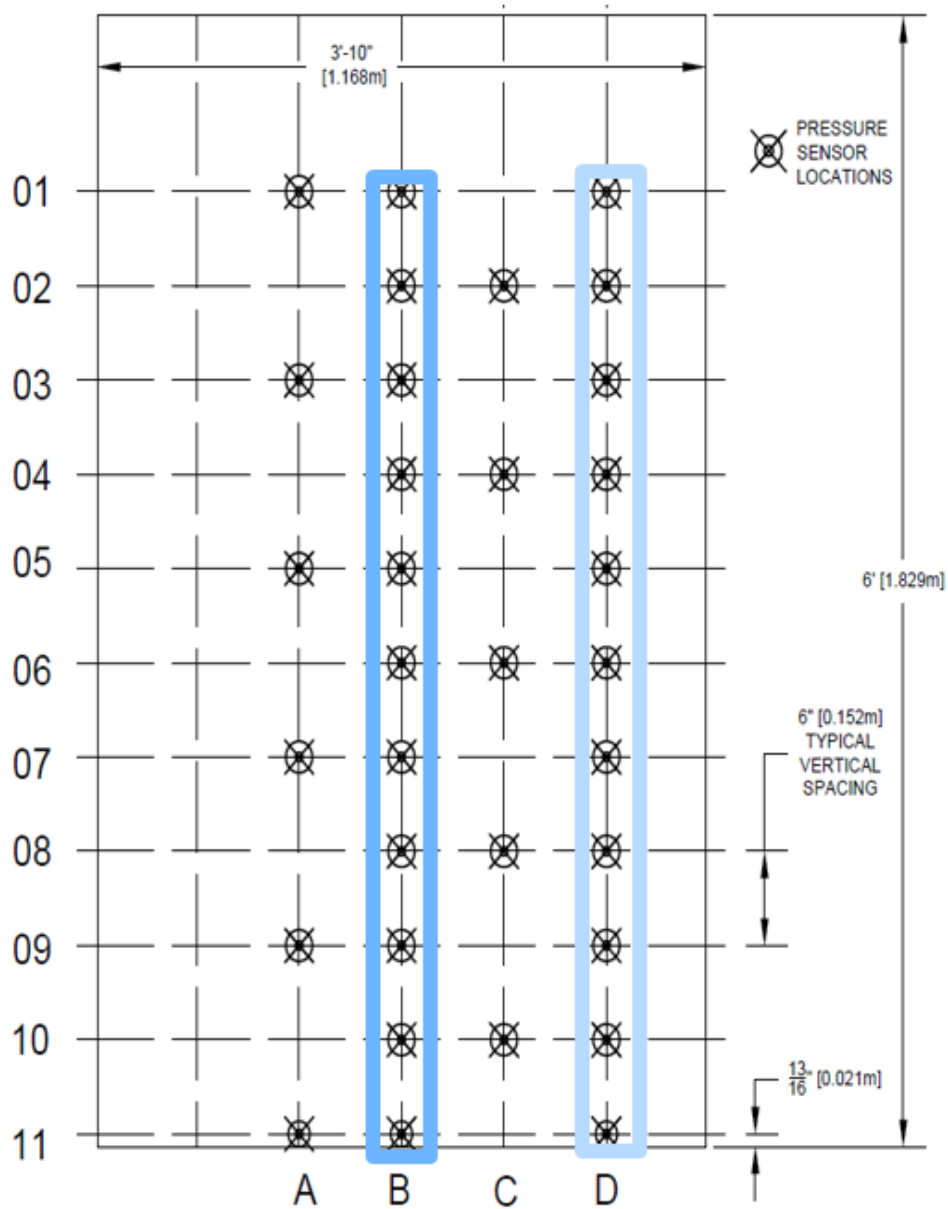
Pressure Sensor Locations on Concrete Shear Wall specimen.
